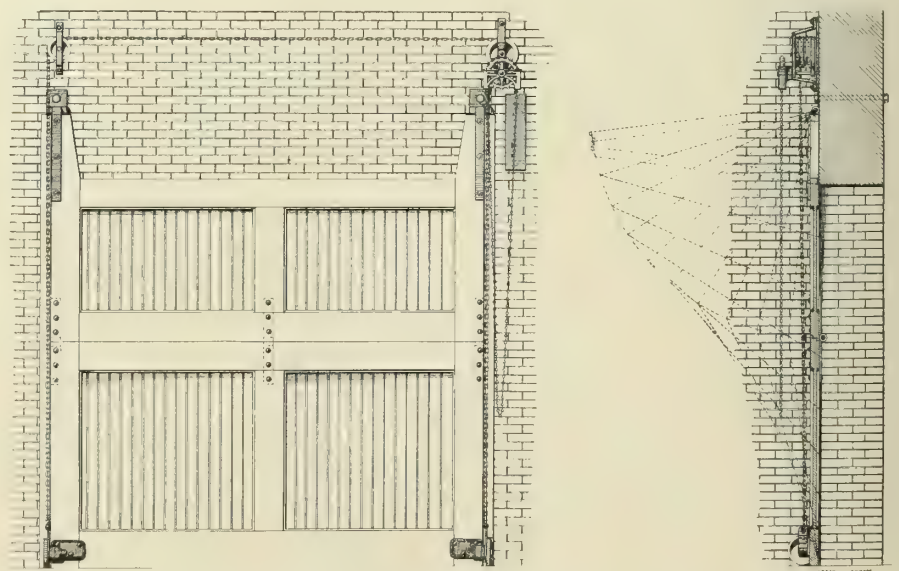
CROSS HORIZONTAL FOLDING DOOR
